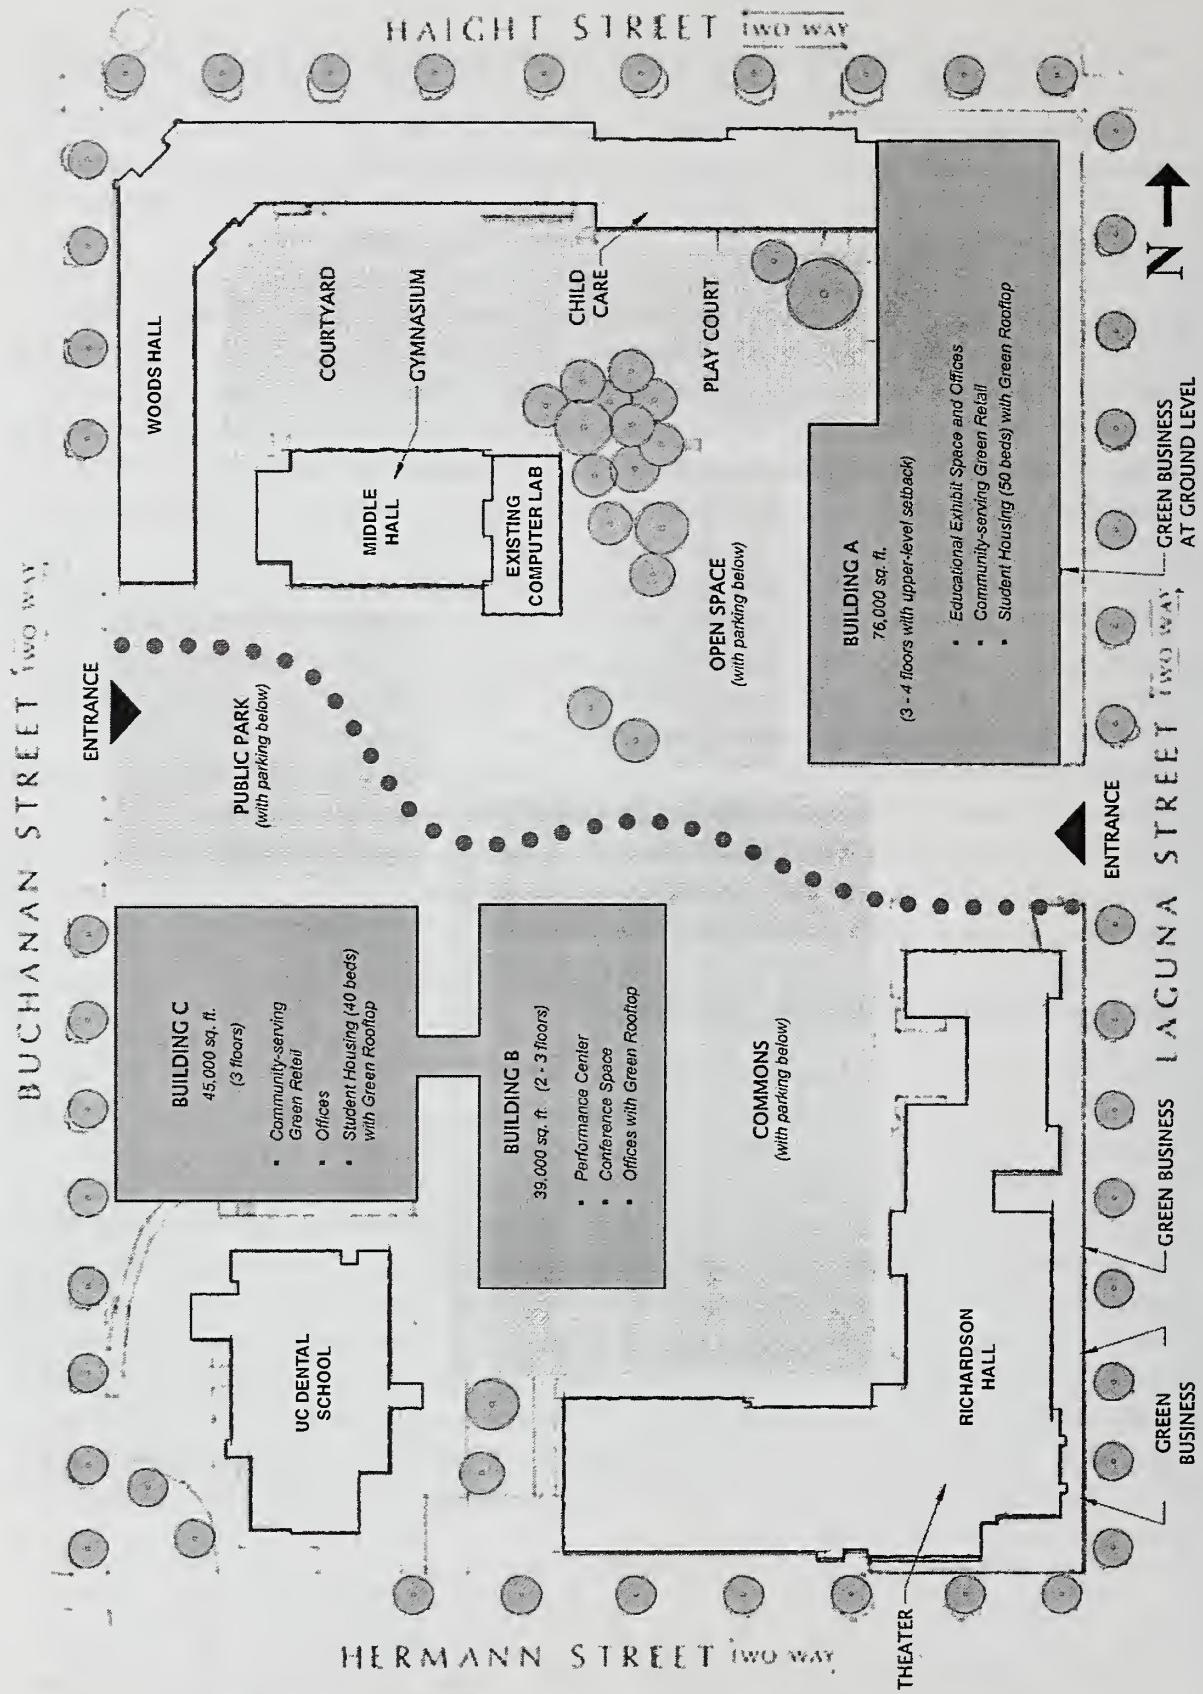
Alternative C: New College of California and Global Citizen Center Concept Plan
